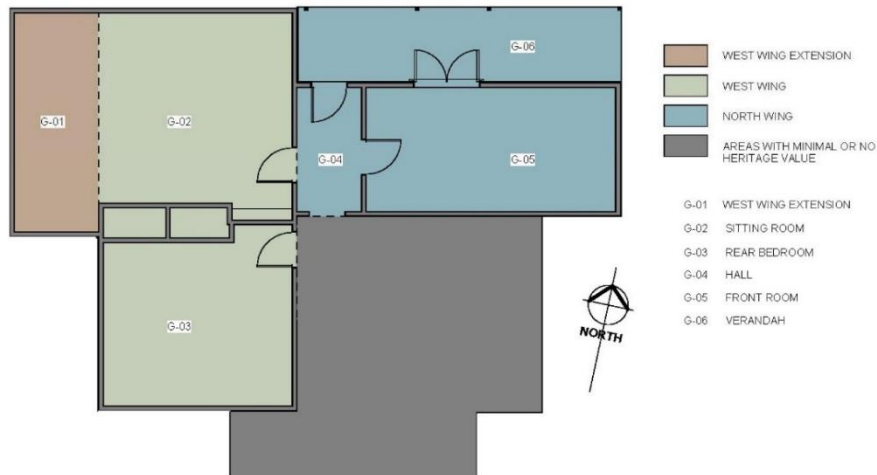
Plan of cottage. The green and teal wings are believed to have been the earliest sections constructed. (DPA Architects)
